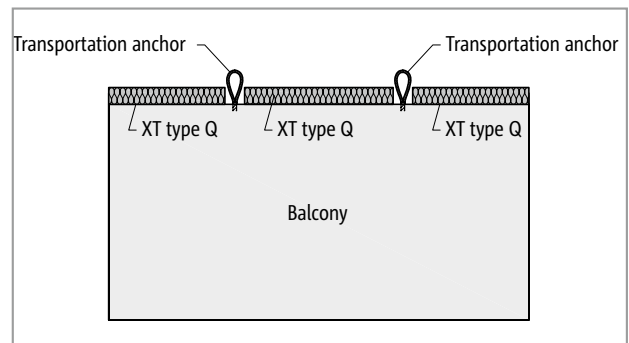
Schöck Isokorb® XT type Q: Precast balcony with transport anchor; insulating adapter XT type Z can be inserted on-site
